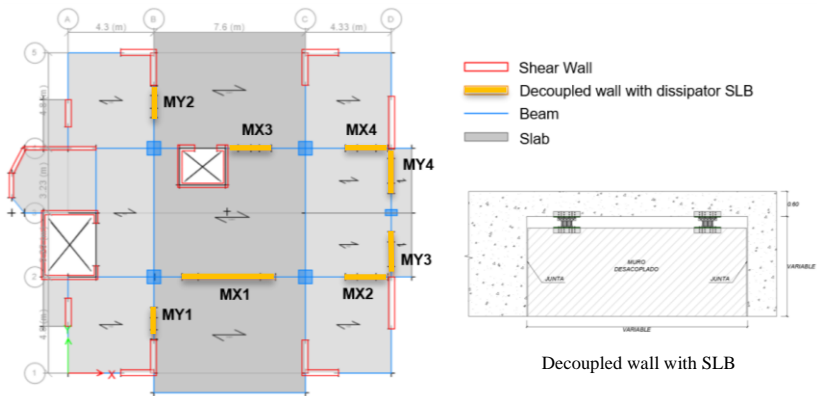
Typical plan of structural model with dissipators and decoupled walls developed in ETABS
